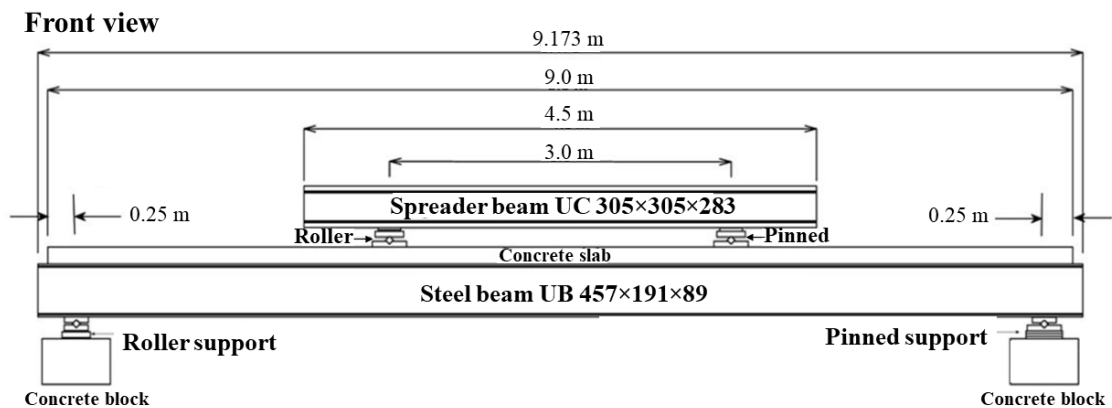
Overview of the four-point bending test of the steel-concrete composite beam.
